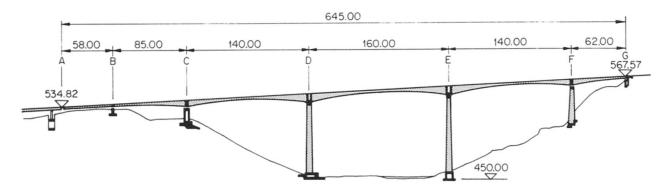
Biaschina Bridge (Ticino, Switzerland)
